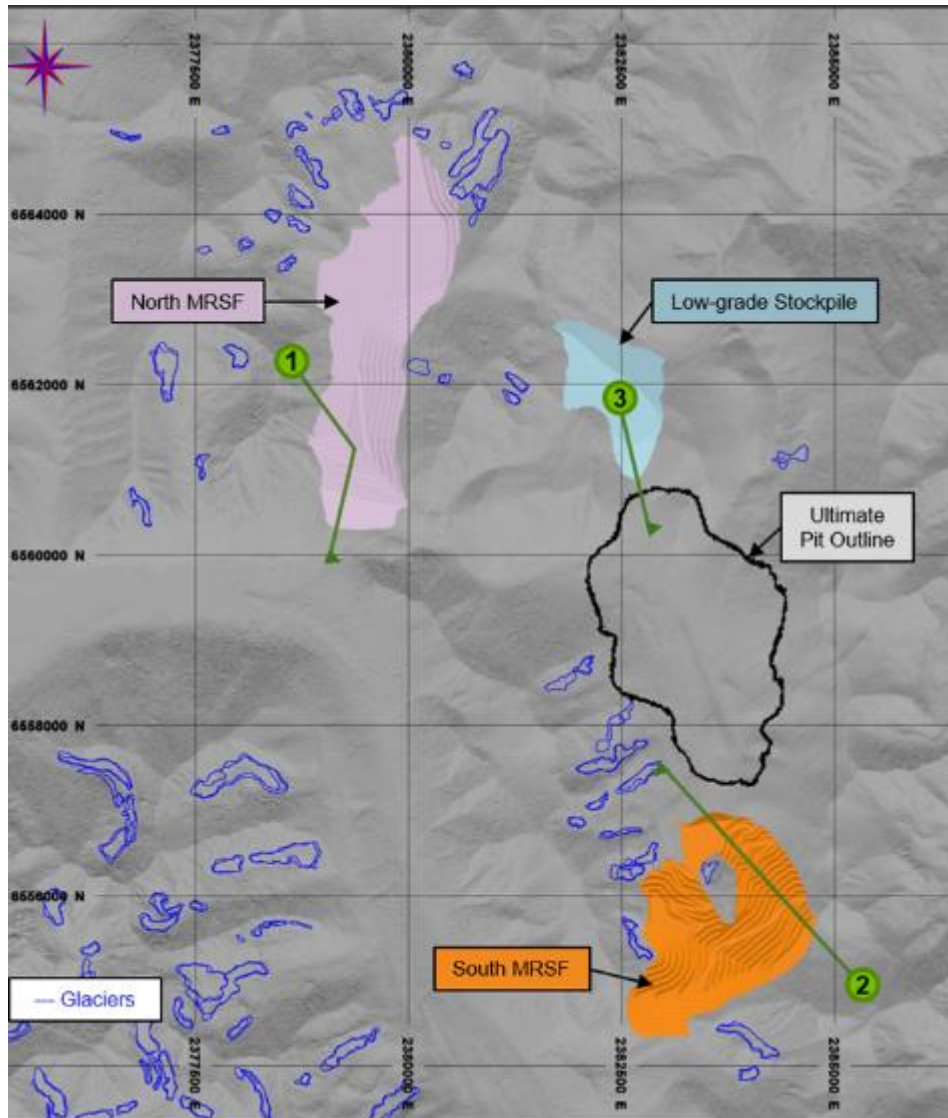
Proposed MRSF's Plan View (showing cross sections)
